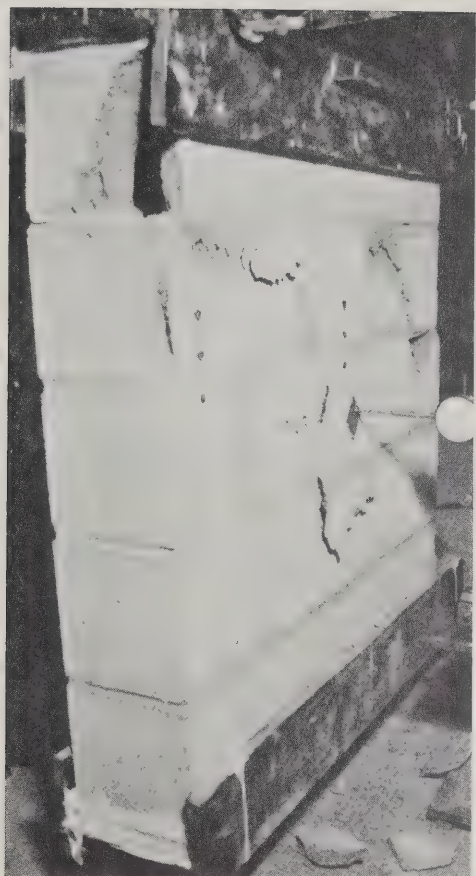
Failures of Short Walls Tested with Pinned Ends
